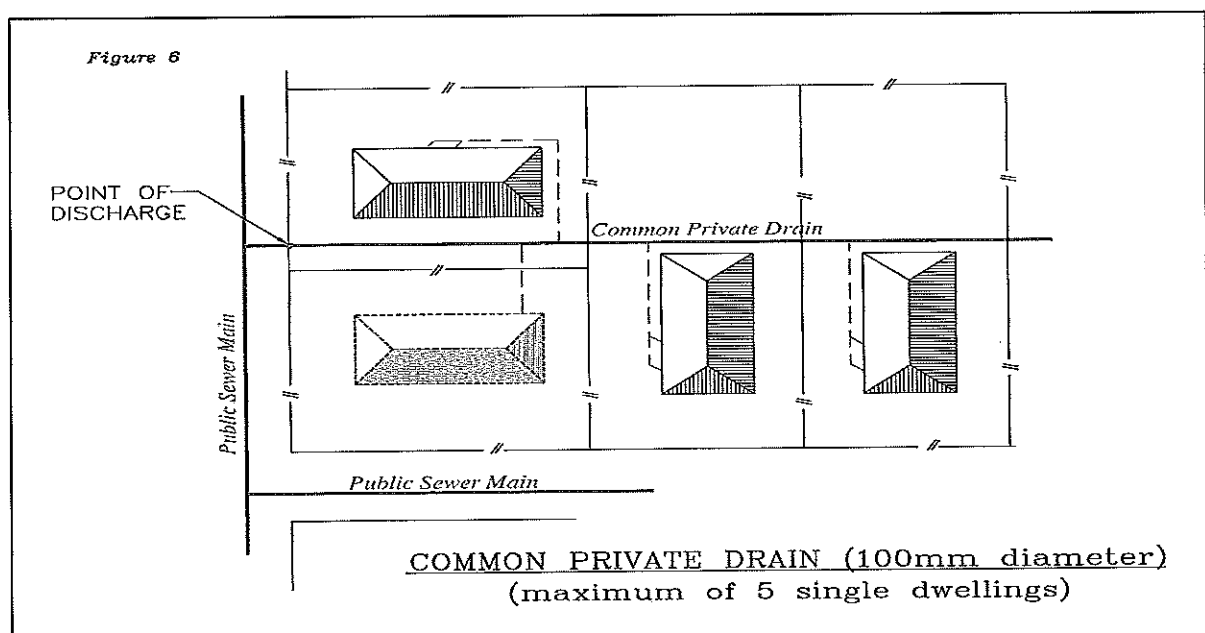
Typical layout at point of discharge – Common private drain 100mm diameter
